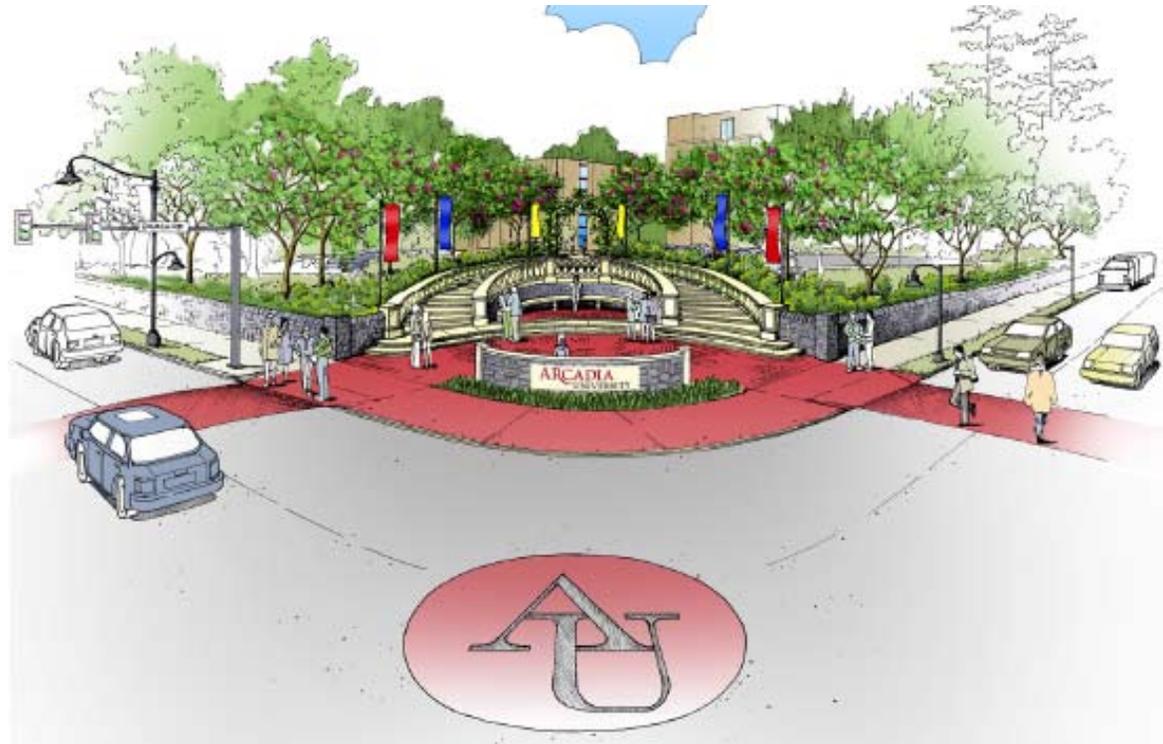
Arcadia University's proposed improvements to the Limekiln and Church Road intersection (Arcadia University Landscape Master Plan, 2006)
